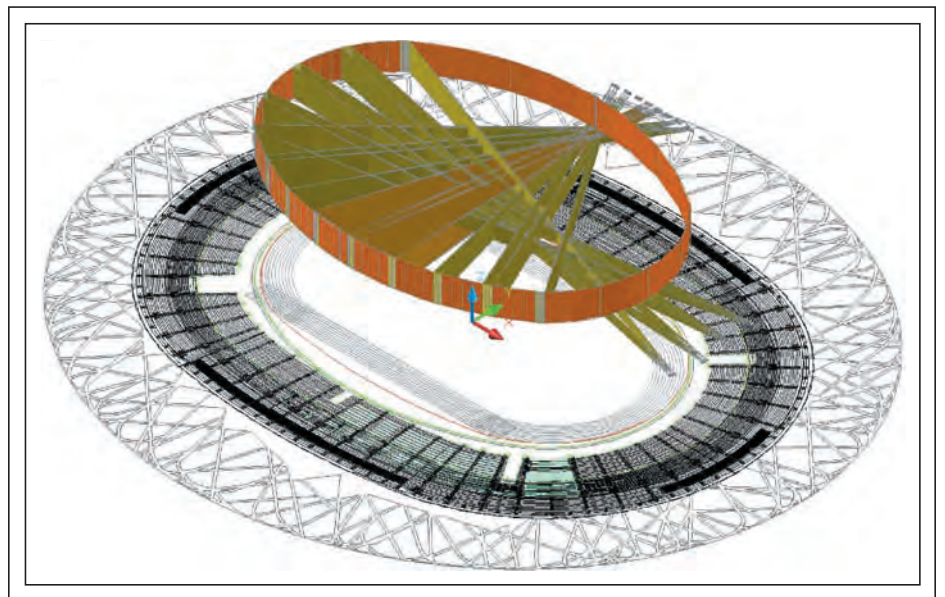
A bird’s eye view of the “Bird’s Nest” stadium in Beijing shows a conceptual layout of digital-cinema projectors from Tier 3 to the roof “Raceway” at top, cross-firing a distance of 700 ft. Source: Christie Digital Systems.
